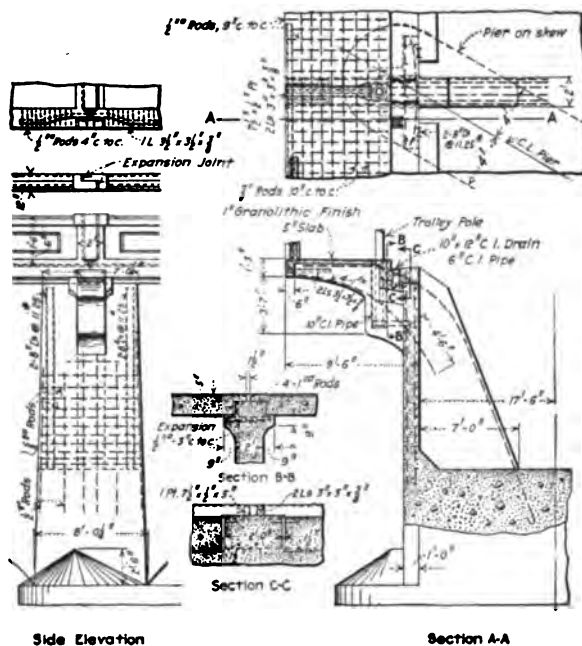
Counterforted spandrel wall, highway bridge at Ansonia, Conn.
